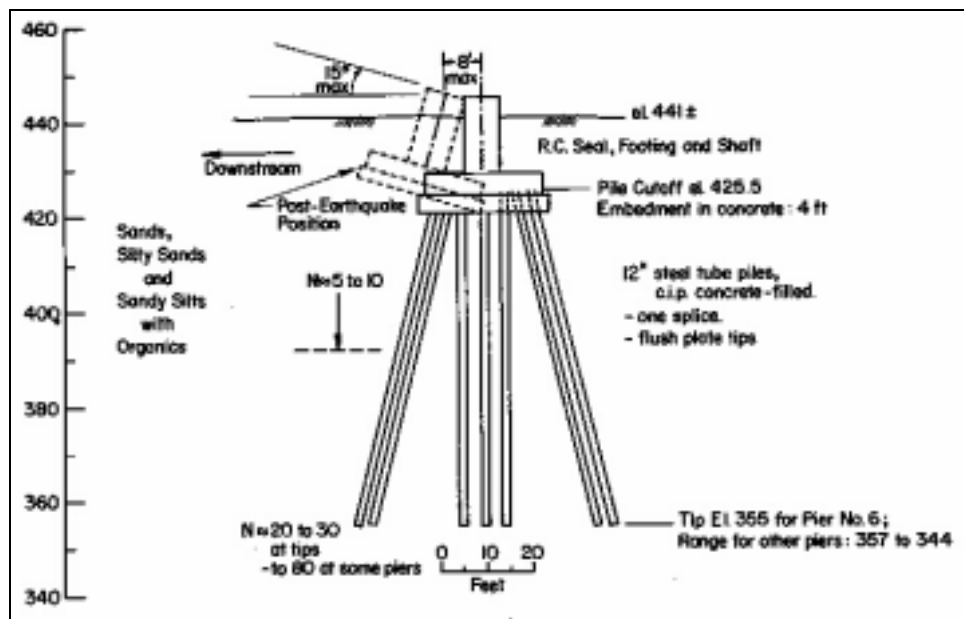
Bridge 605A. Lateral Elevation of Pier 6 as Constructed at Time of Earthquake.
